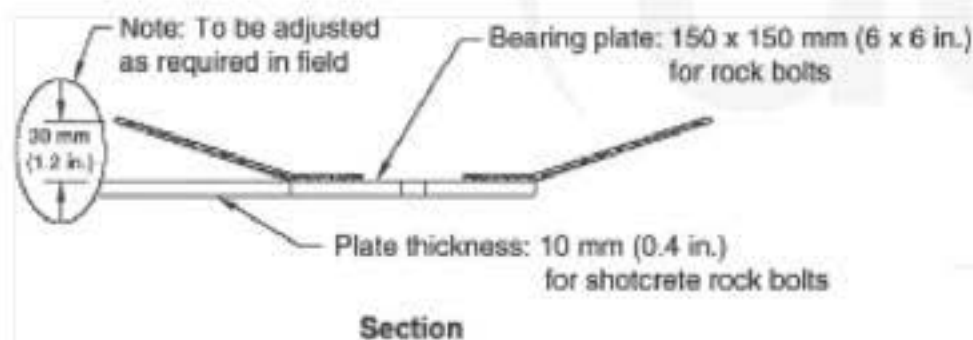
Rock bolt anchor plates with reinforcing bar “wings.”
